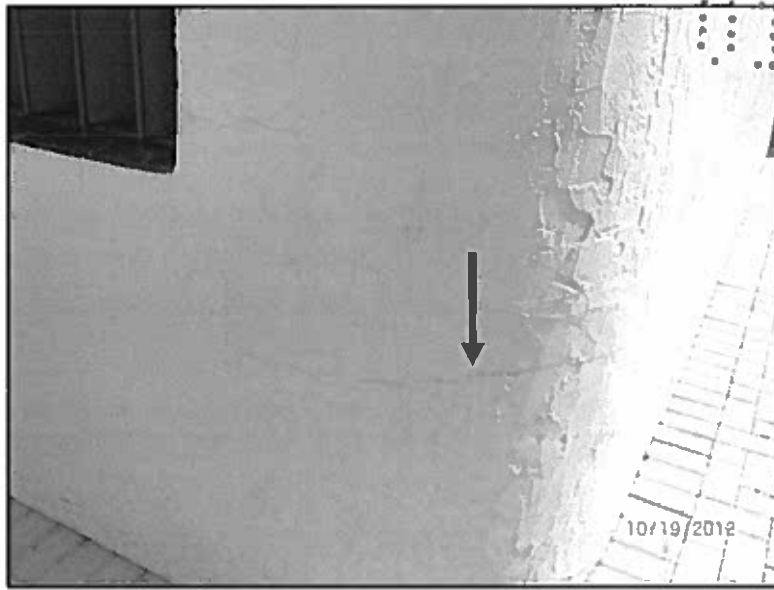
stucco cracking on East side of building corner at pool deck area
